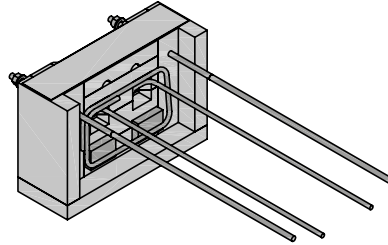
Isometric drawing: Schöck Isokorb® type RKS10
